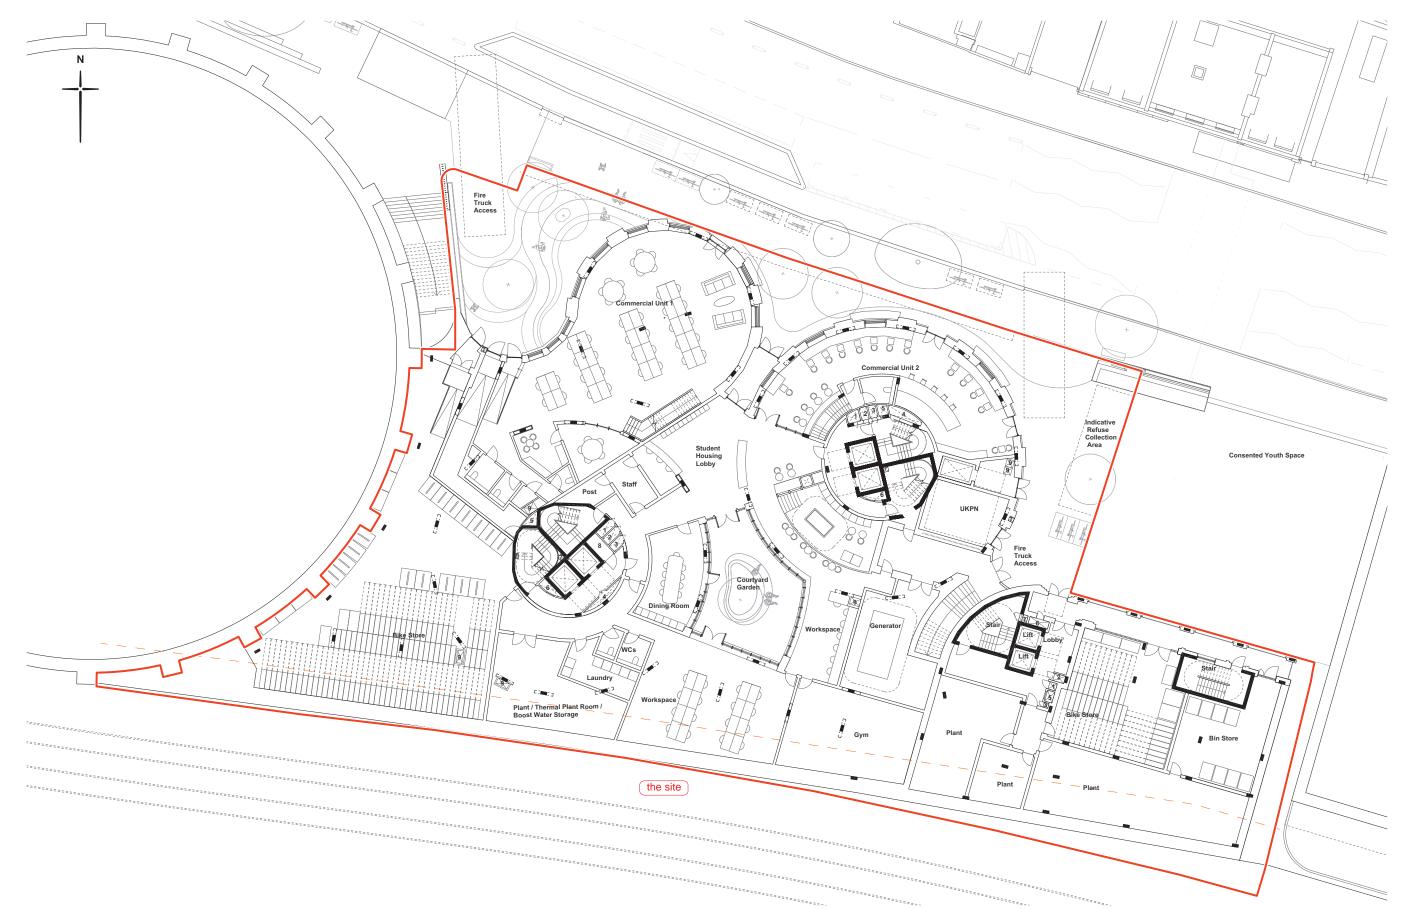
Proposed ground floor (DSDHA, dwg no. 356_P20.100, 1:150@A1, rev. G 16/01/24)
